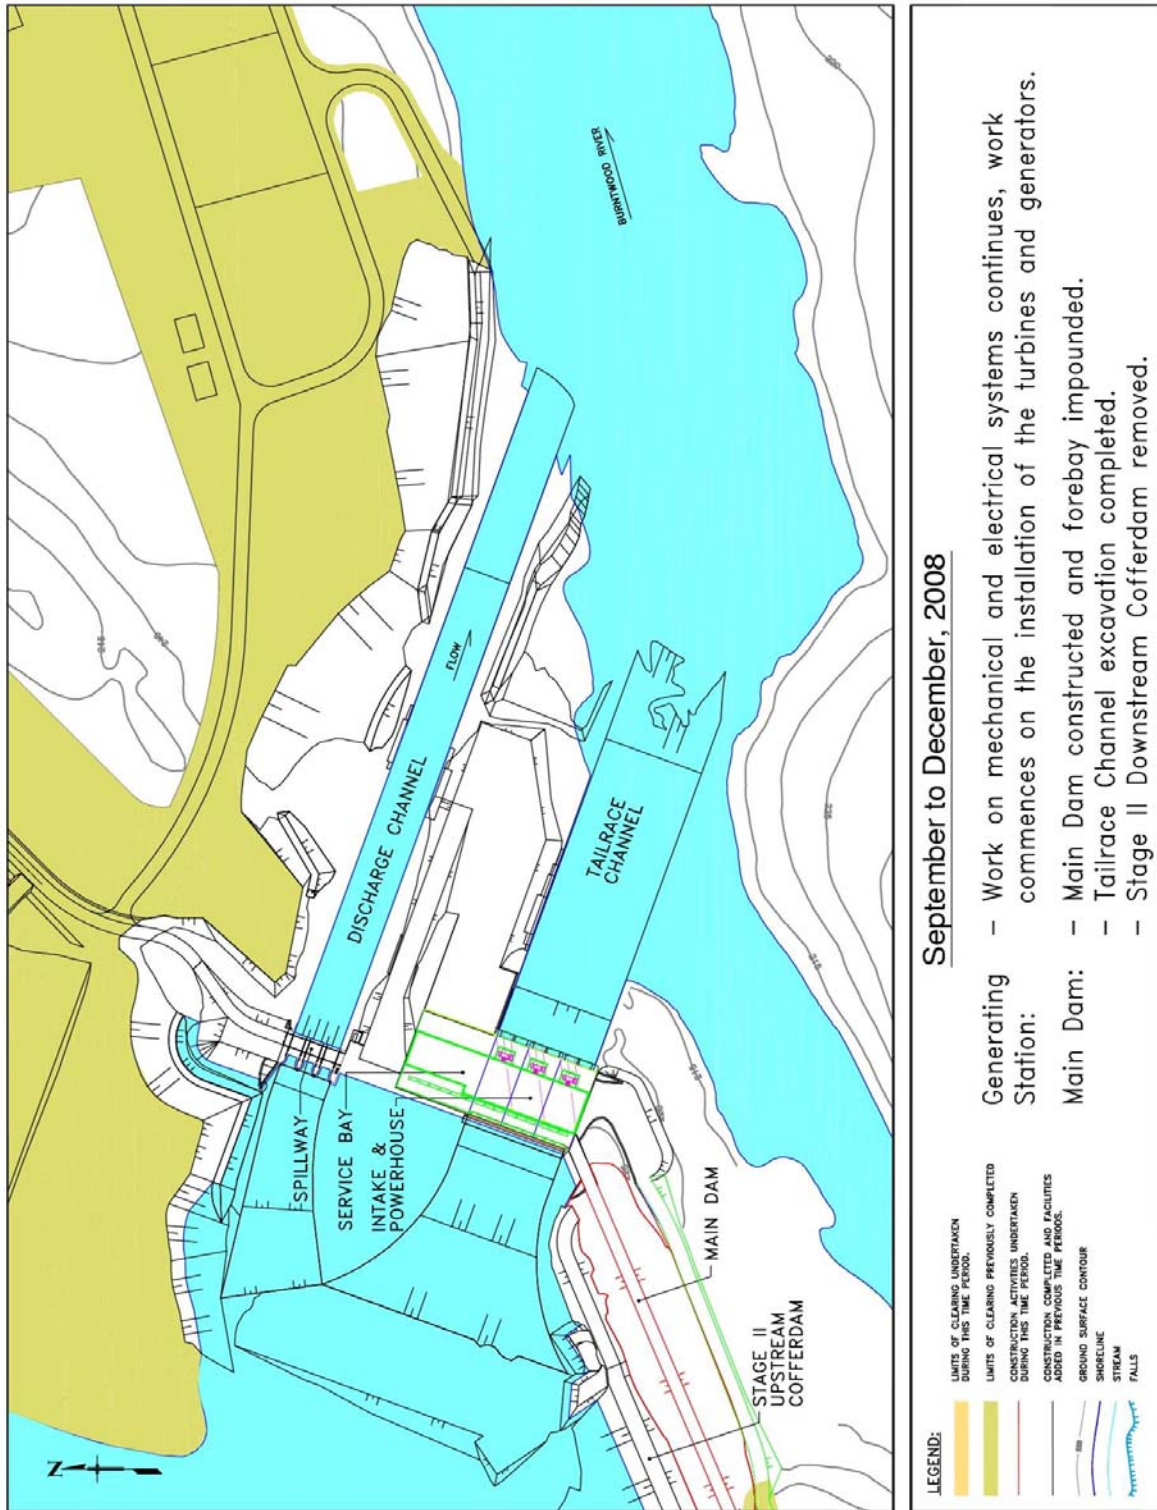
Proposed Construction Activities – September to December 2008
